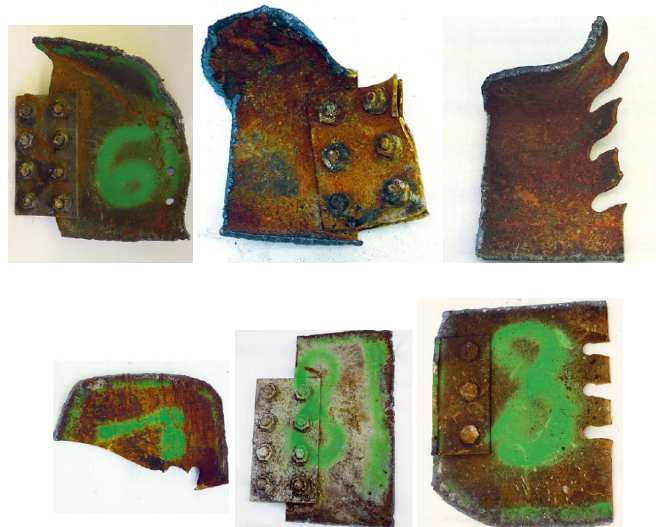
Details of failed connection due to web tear out in 6th, 7th and 8th floors of WTC5
